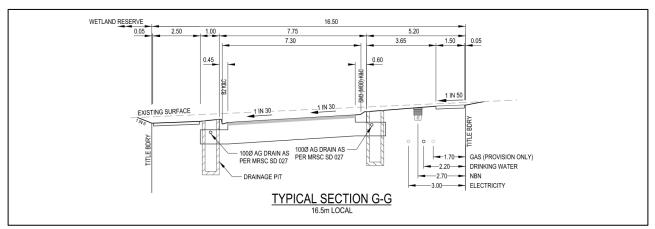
Local Access Street – Open Space Interface / Townhouse Cross Section – Opt 3 (16.5m)
